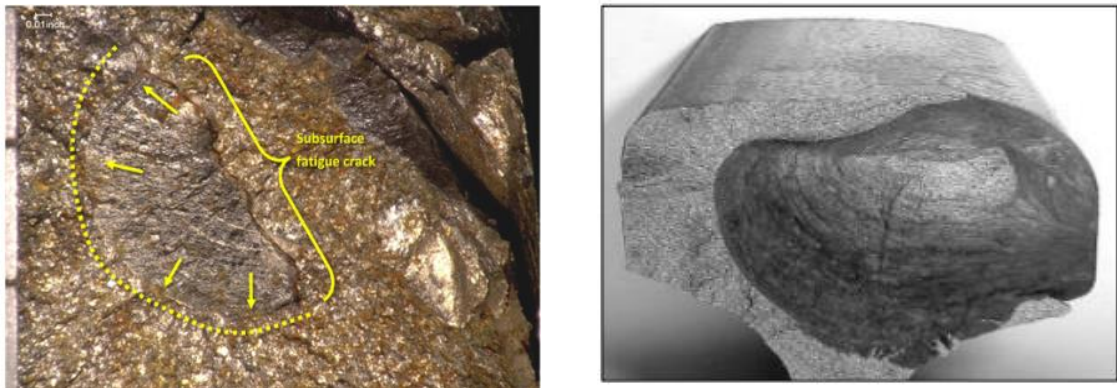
Tache Ovale and a subsurface fatigue fracture on the gauge side of the head [28-29].
